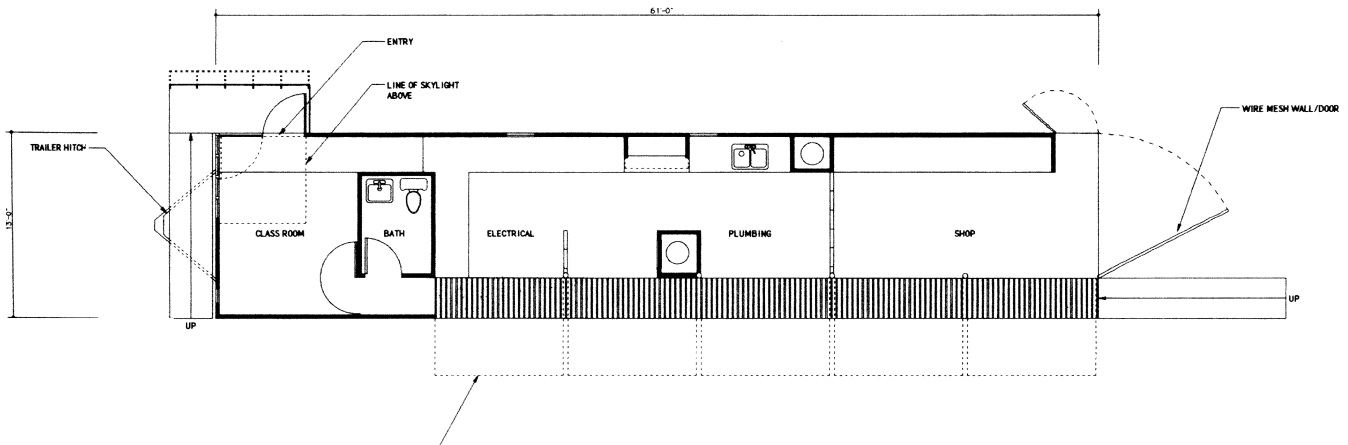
The Portable Construction Training Center (PCTC) plan.
